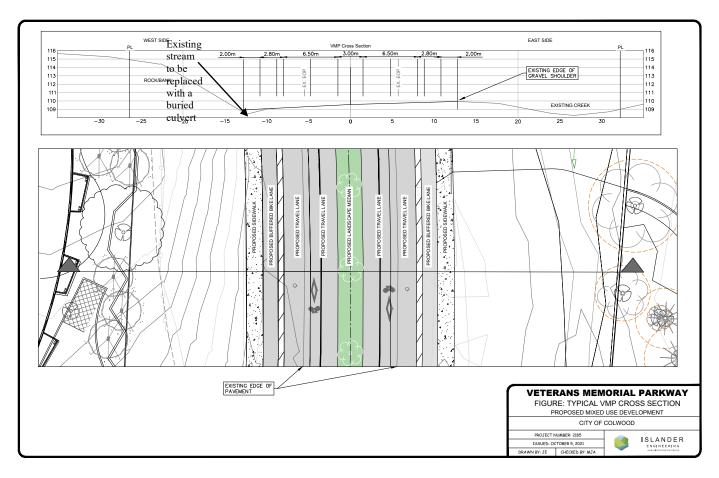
Islander Engineering drawing showing the proposed 5-lane improvement to VMP. The cross section shows the edge of the proposed disturbance footprint. It is assumed that there will be a gravel shoulder extending ~0.5 m beyond the outside border of the sidewalks. Note that the existing stream on the west side of VMP is shown as being buried. This stream will be required to be moved laterally to the west ~2.5 m or be culverted. A WSA Section 11 Approval will be required to realign this existing stream. FLNRORD will determine the realignment option and compensation for the loss of the existing open stream channel. Water quality and quantity of road runoff will also be required to be compensated.
